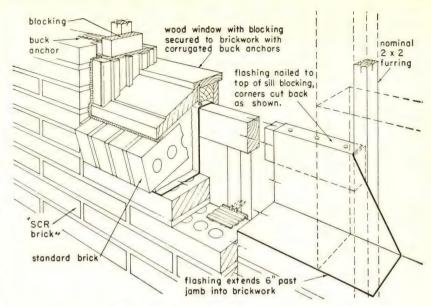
Installation of Wood Window Frame Courtesy of Structural Clay Products Institute
